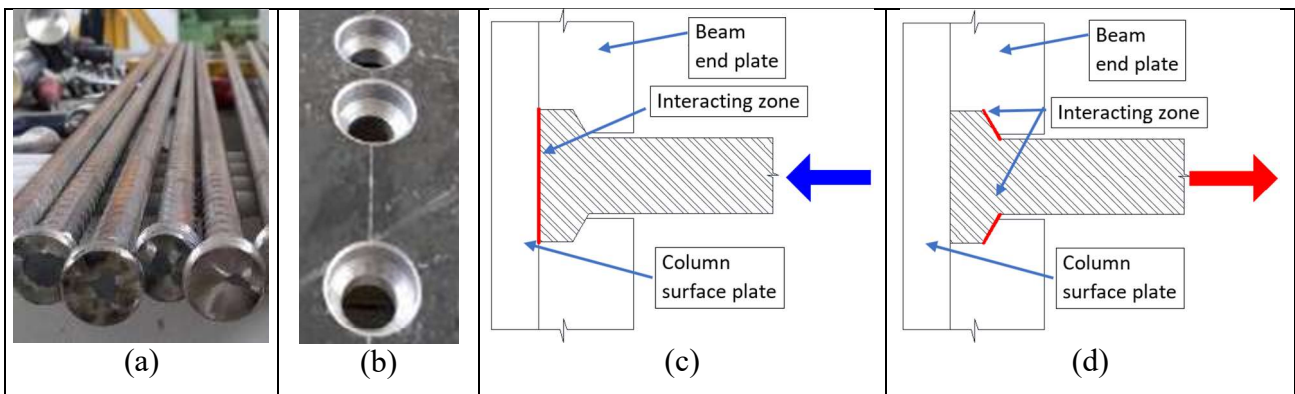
Details of rivet head rebar; (a) Rivet head rebar; (b) Hole for rivet head rebar; (c) Load transfer mechanism in compression; (d) Load transfer mechanism in tension
